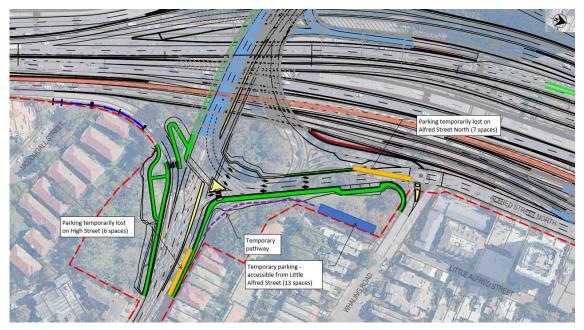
Temporary parking arrangements at Little Alfred Street
